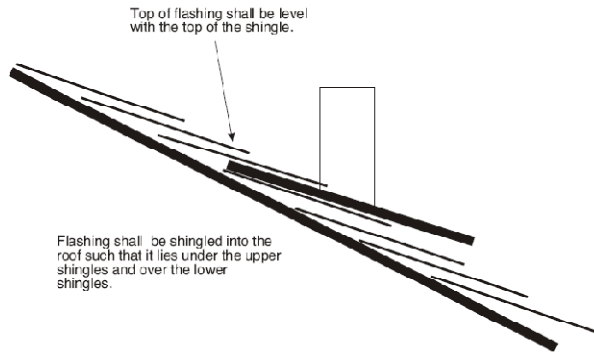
Water-shedding tile and shingle configuration for steep-slope roof systems
